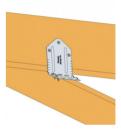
VTCR - View showing correct fastener installation into supporting truss
